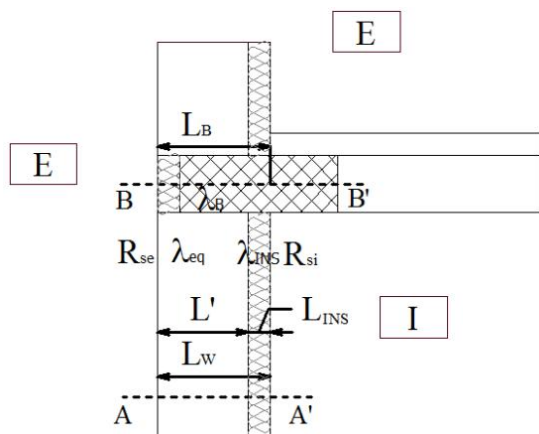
External wall insulated inside with un-insulated plane roof, insulated beam and insulated parapet
